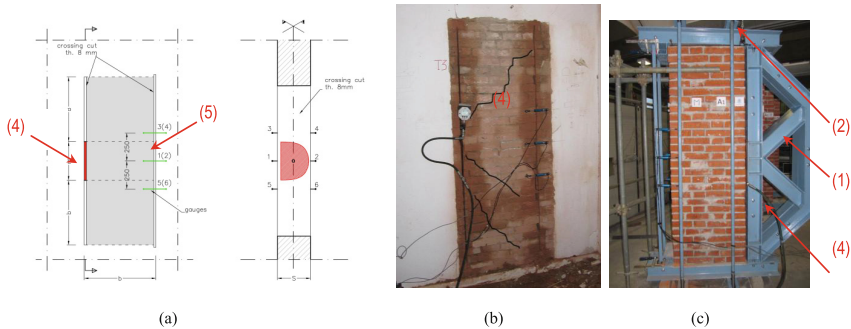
(a) Lay-out of test, (b) masonry sample with the relevant diagonal cracks, (c) set-up of the contrast frame
